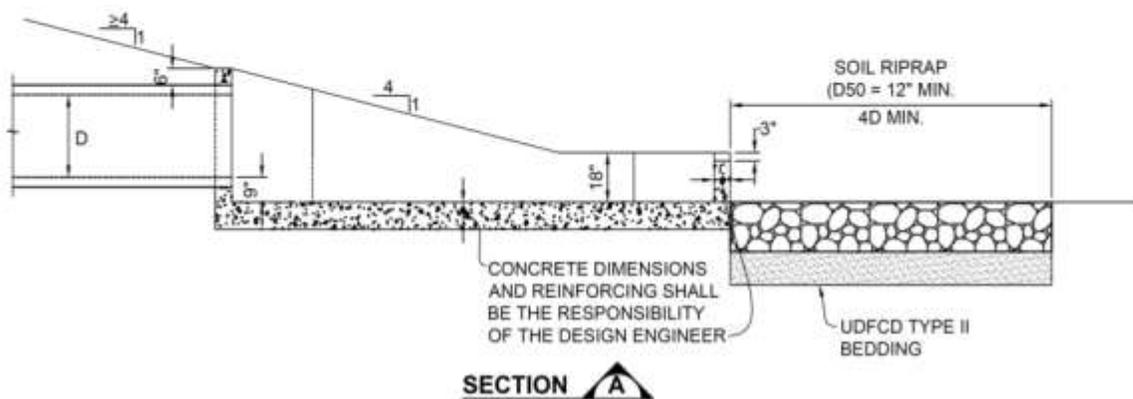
Concept for Integral Forebay at Pipe Outfall
